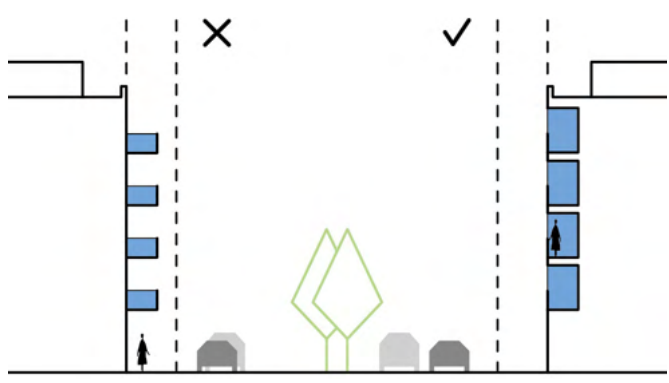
Balconies should not overhang the public highway or disrupt consistent building lines.
